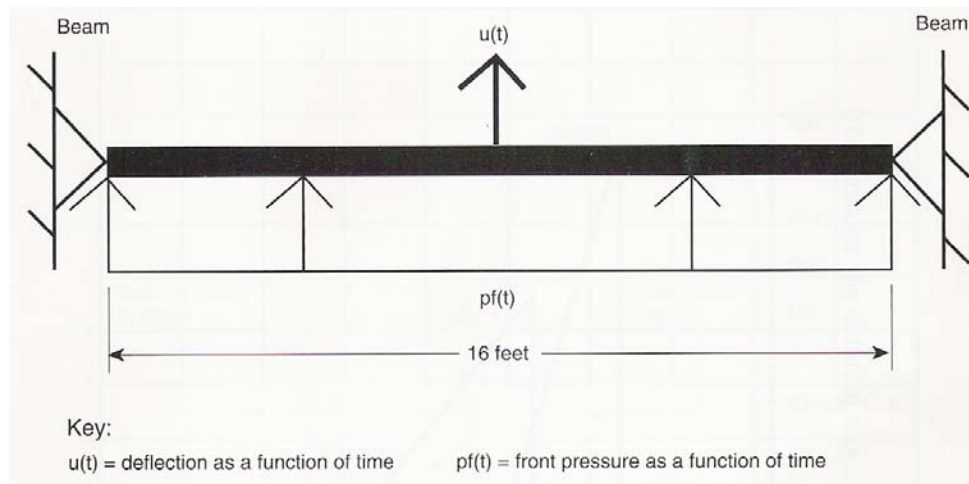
Model Of Floor Slab Used By BPAT Engineers (FEMA 1996)
